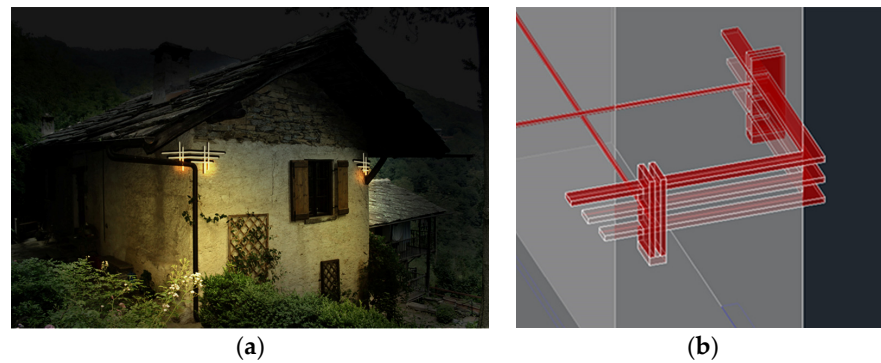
Alpine building reinforced with tie-rods. The anchorage is composed of a modular element and light spots. Photo credits: L. Ferrari, 2017.
